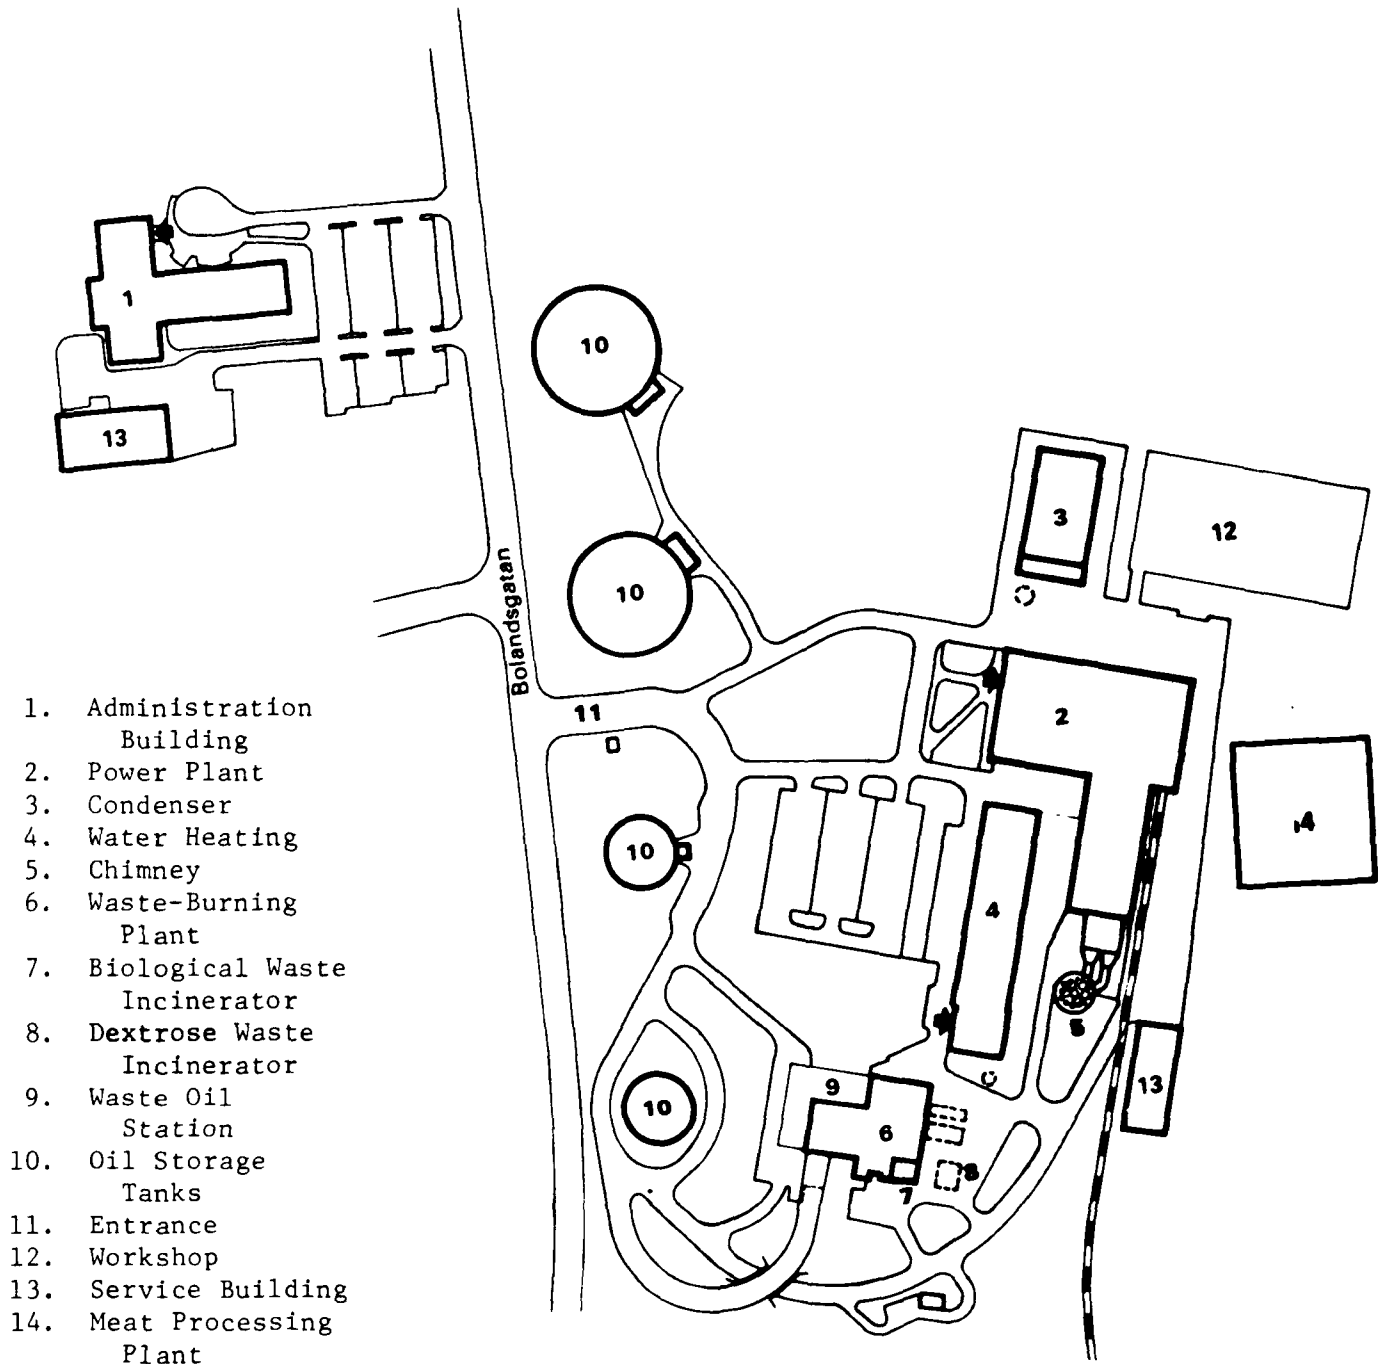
PLAN OF BOLANDERNA FACILITY FOR DISTRICT HEATING AND SOLID WASTE BURNING
